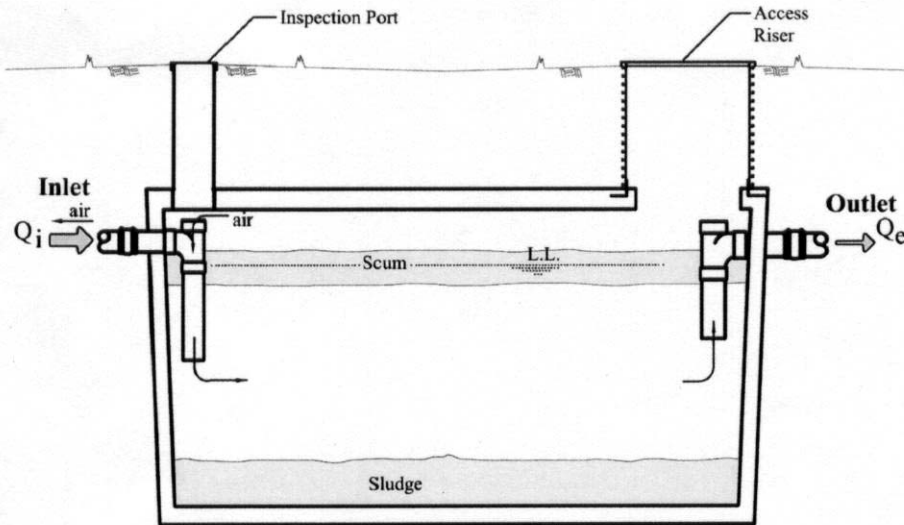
Section view of single compartment concrete tank, 1,000 gallon
